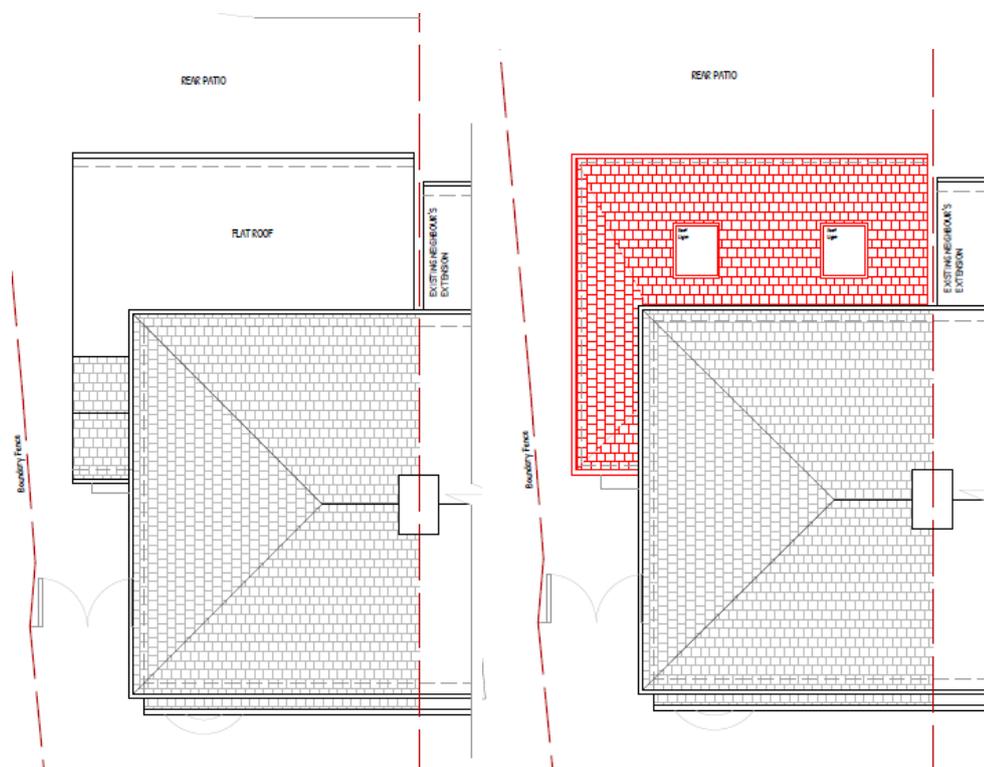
Existing(left) and proposed(right) roof at 44 Heath Road
